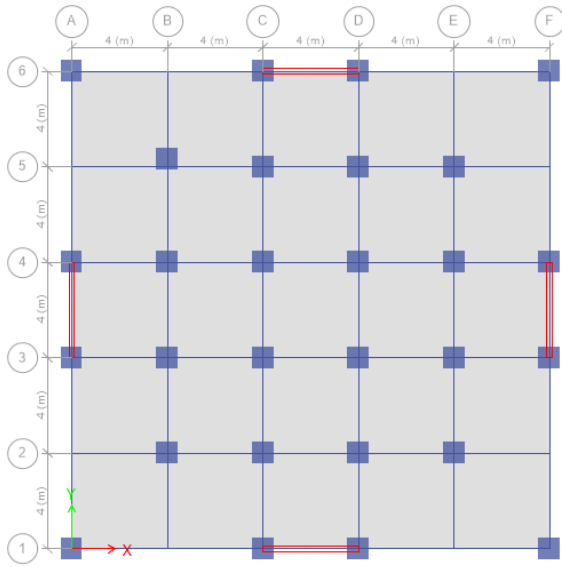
1<sup>st</sup> storey plan of building without shear wall
